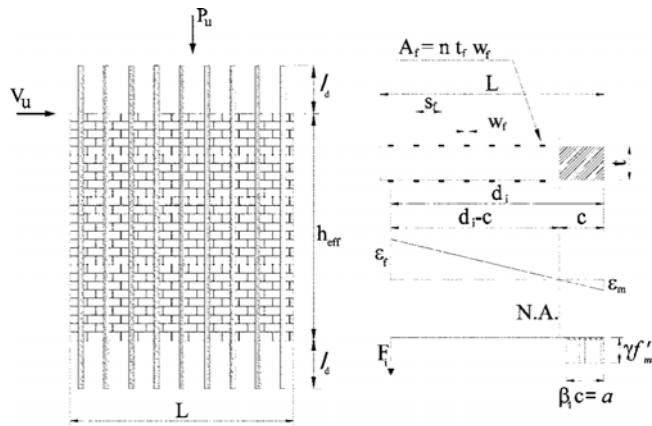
Fiber-reinforced polymer strengthening of flexure-controlled masonry wall.
